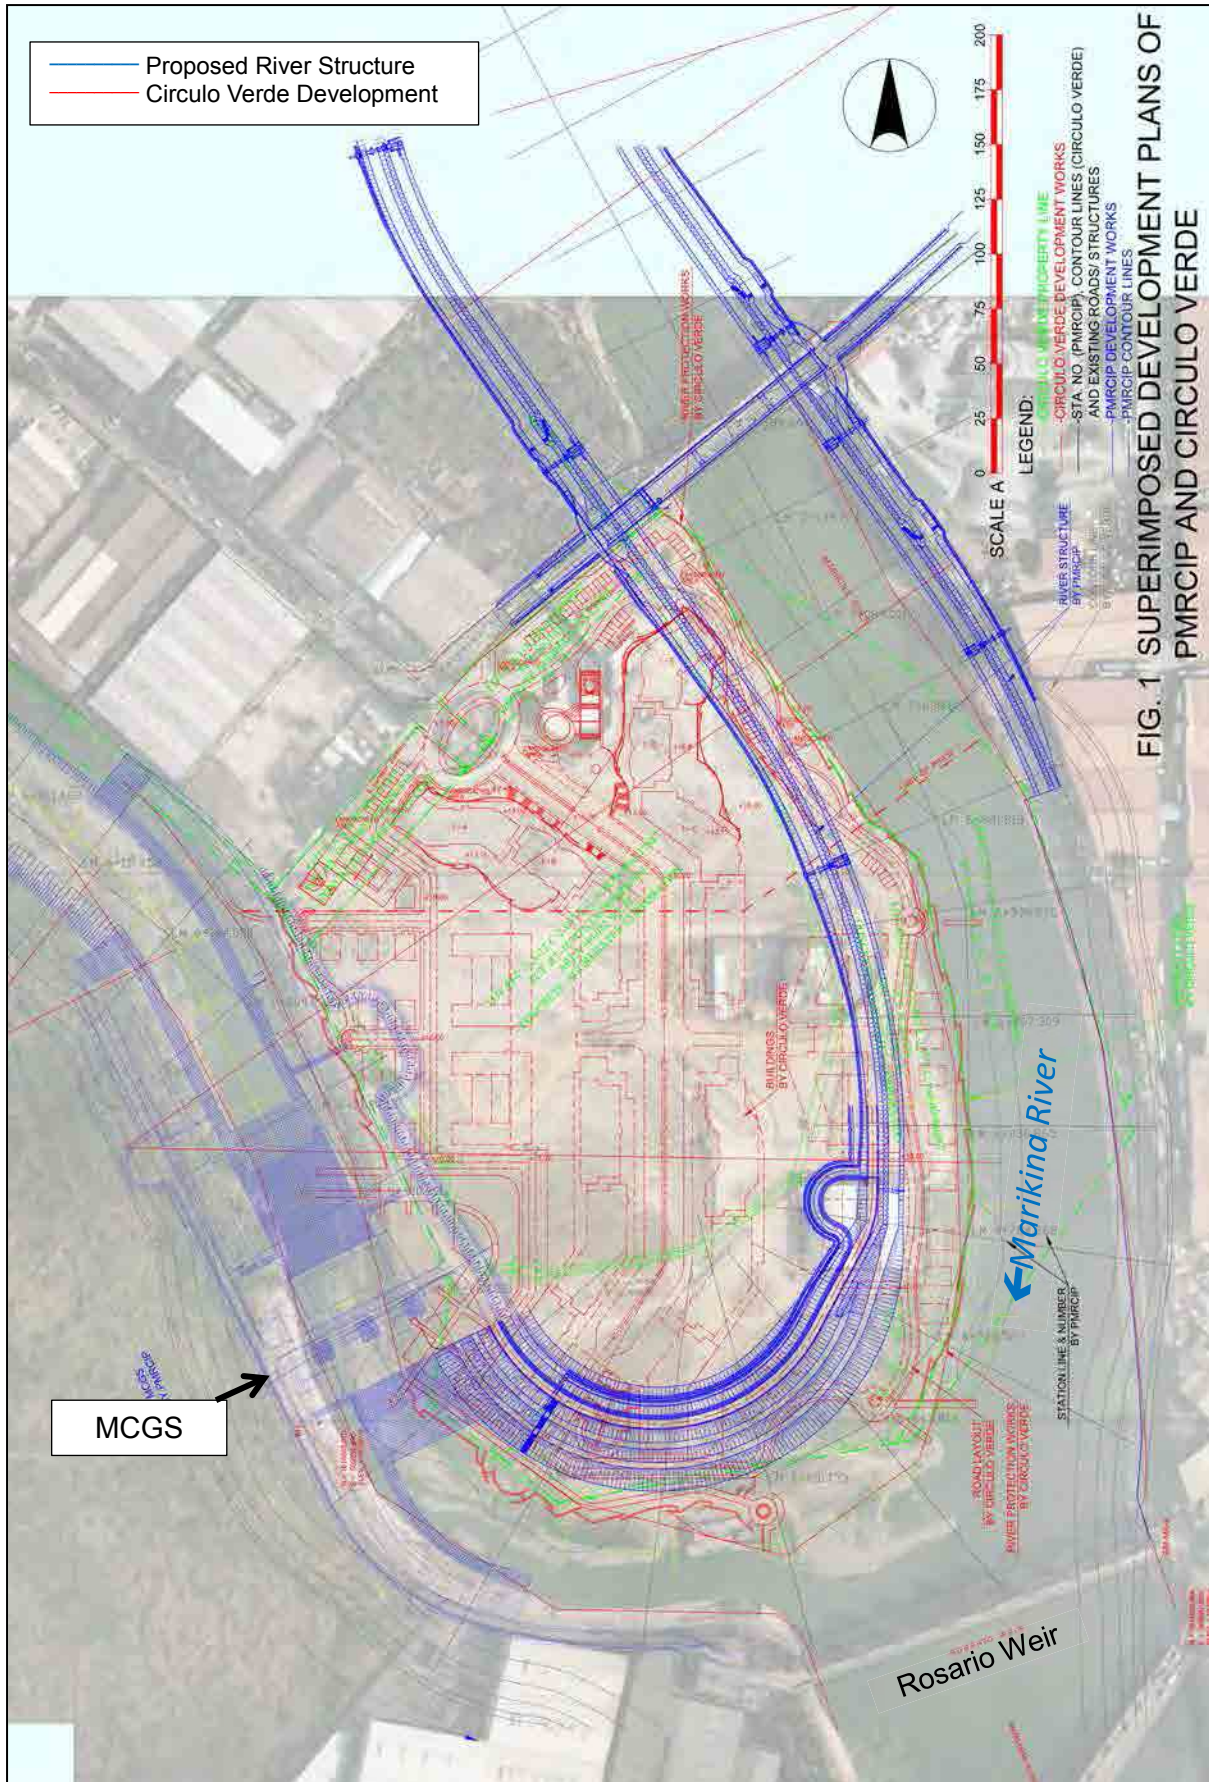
Circulo Verde Layout and Proposed Embankment Plan
